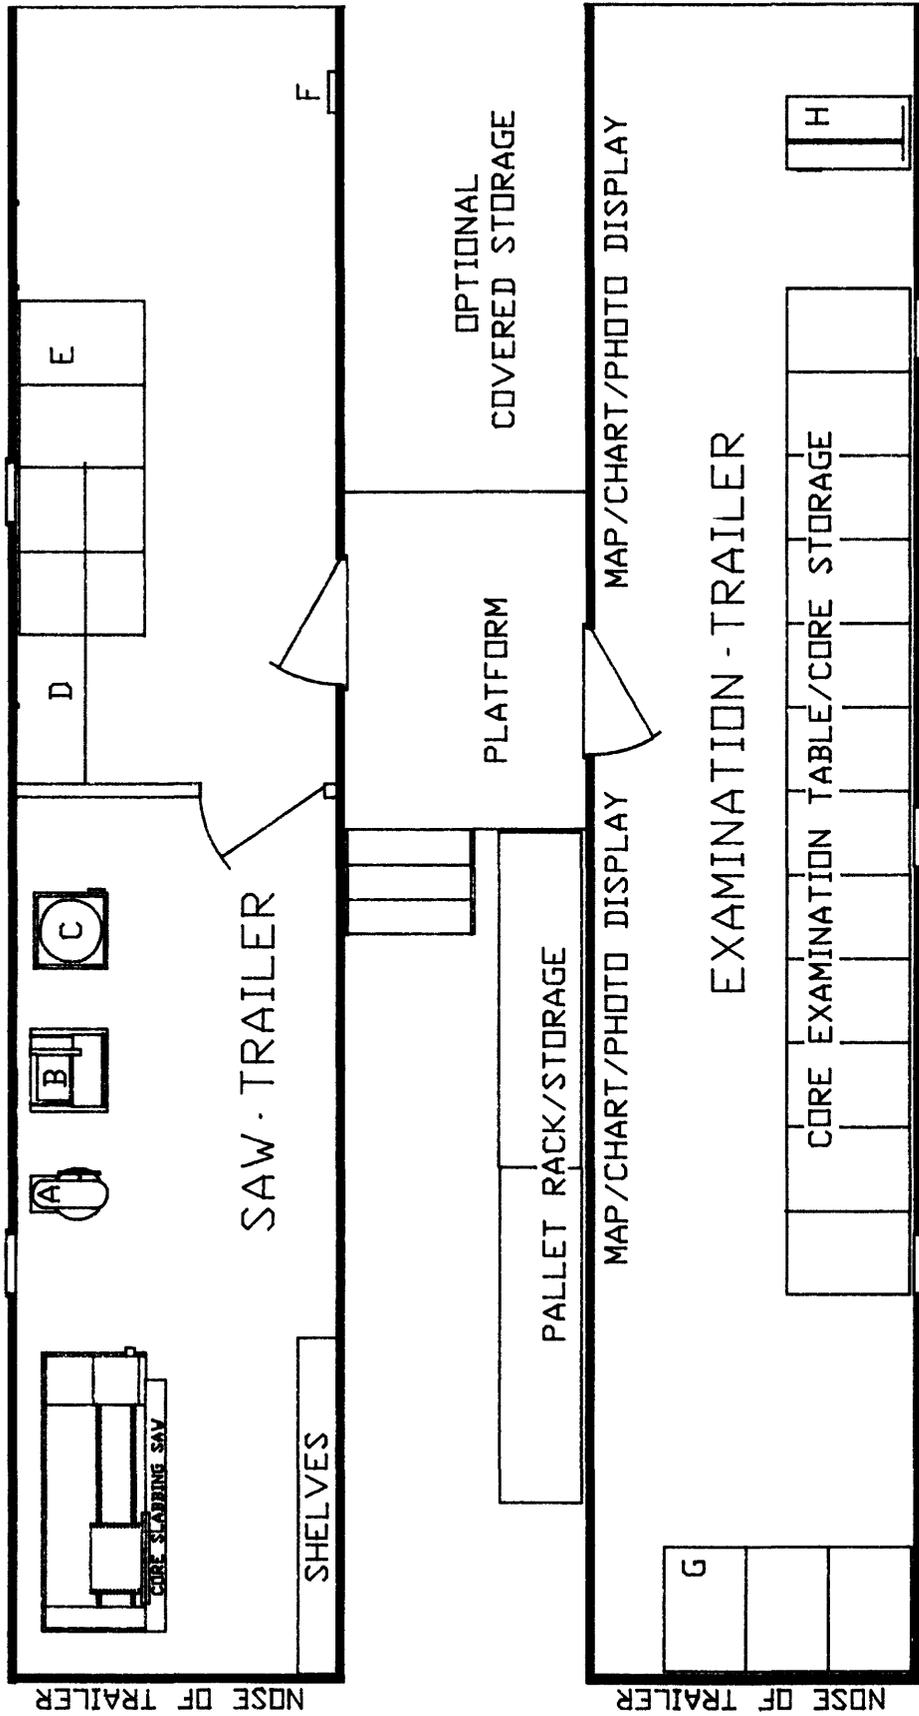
FLOOR PLAN FOR EXAMINATION & SAW TRAILERS
